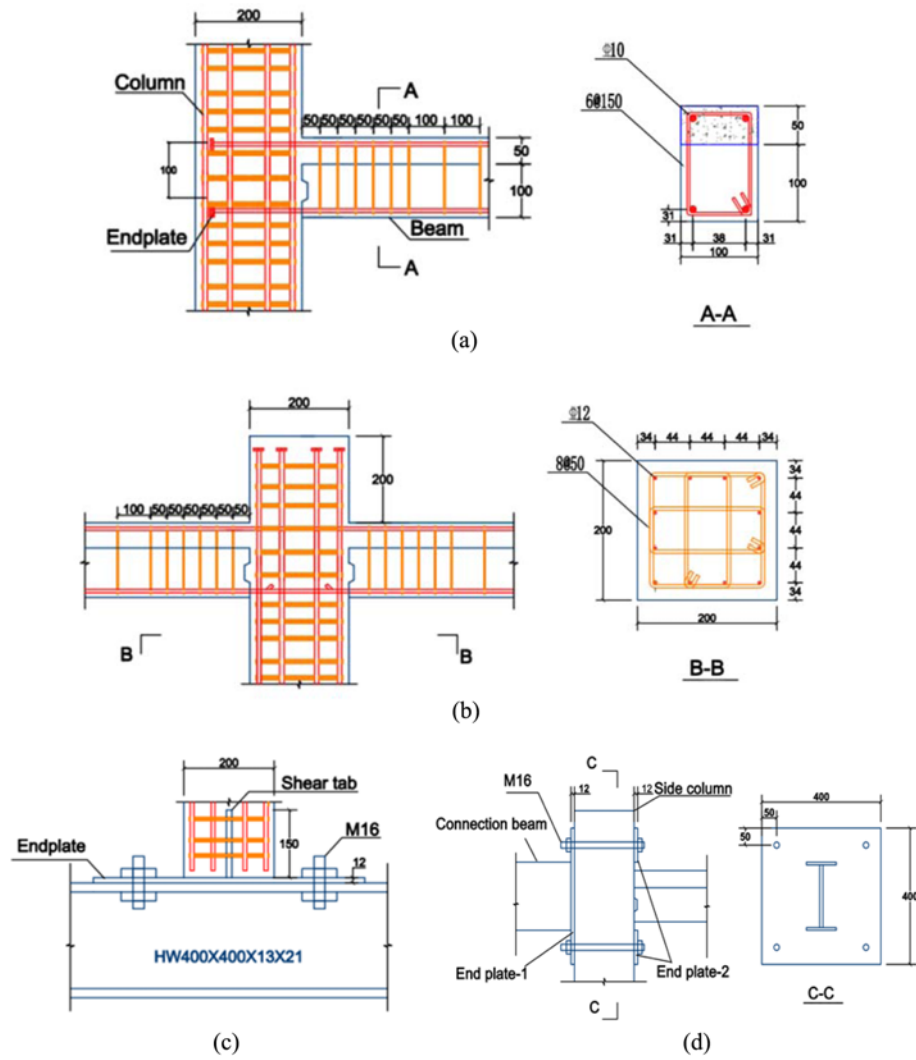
Geometric Dimensions and Connection Details of the Specimen: (a) Side Column-Beam Connection, (b) Middle Column-Beam Connection, (c) Column End Connection, (d) Horizontal Restraint for the Side Column
